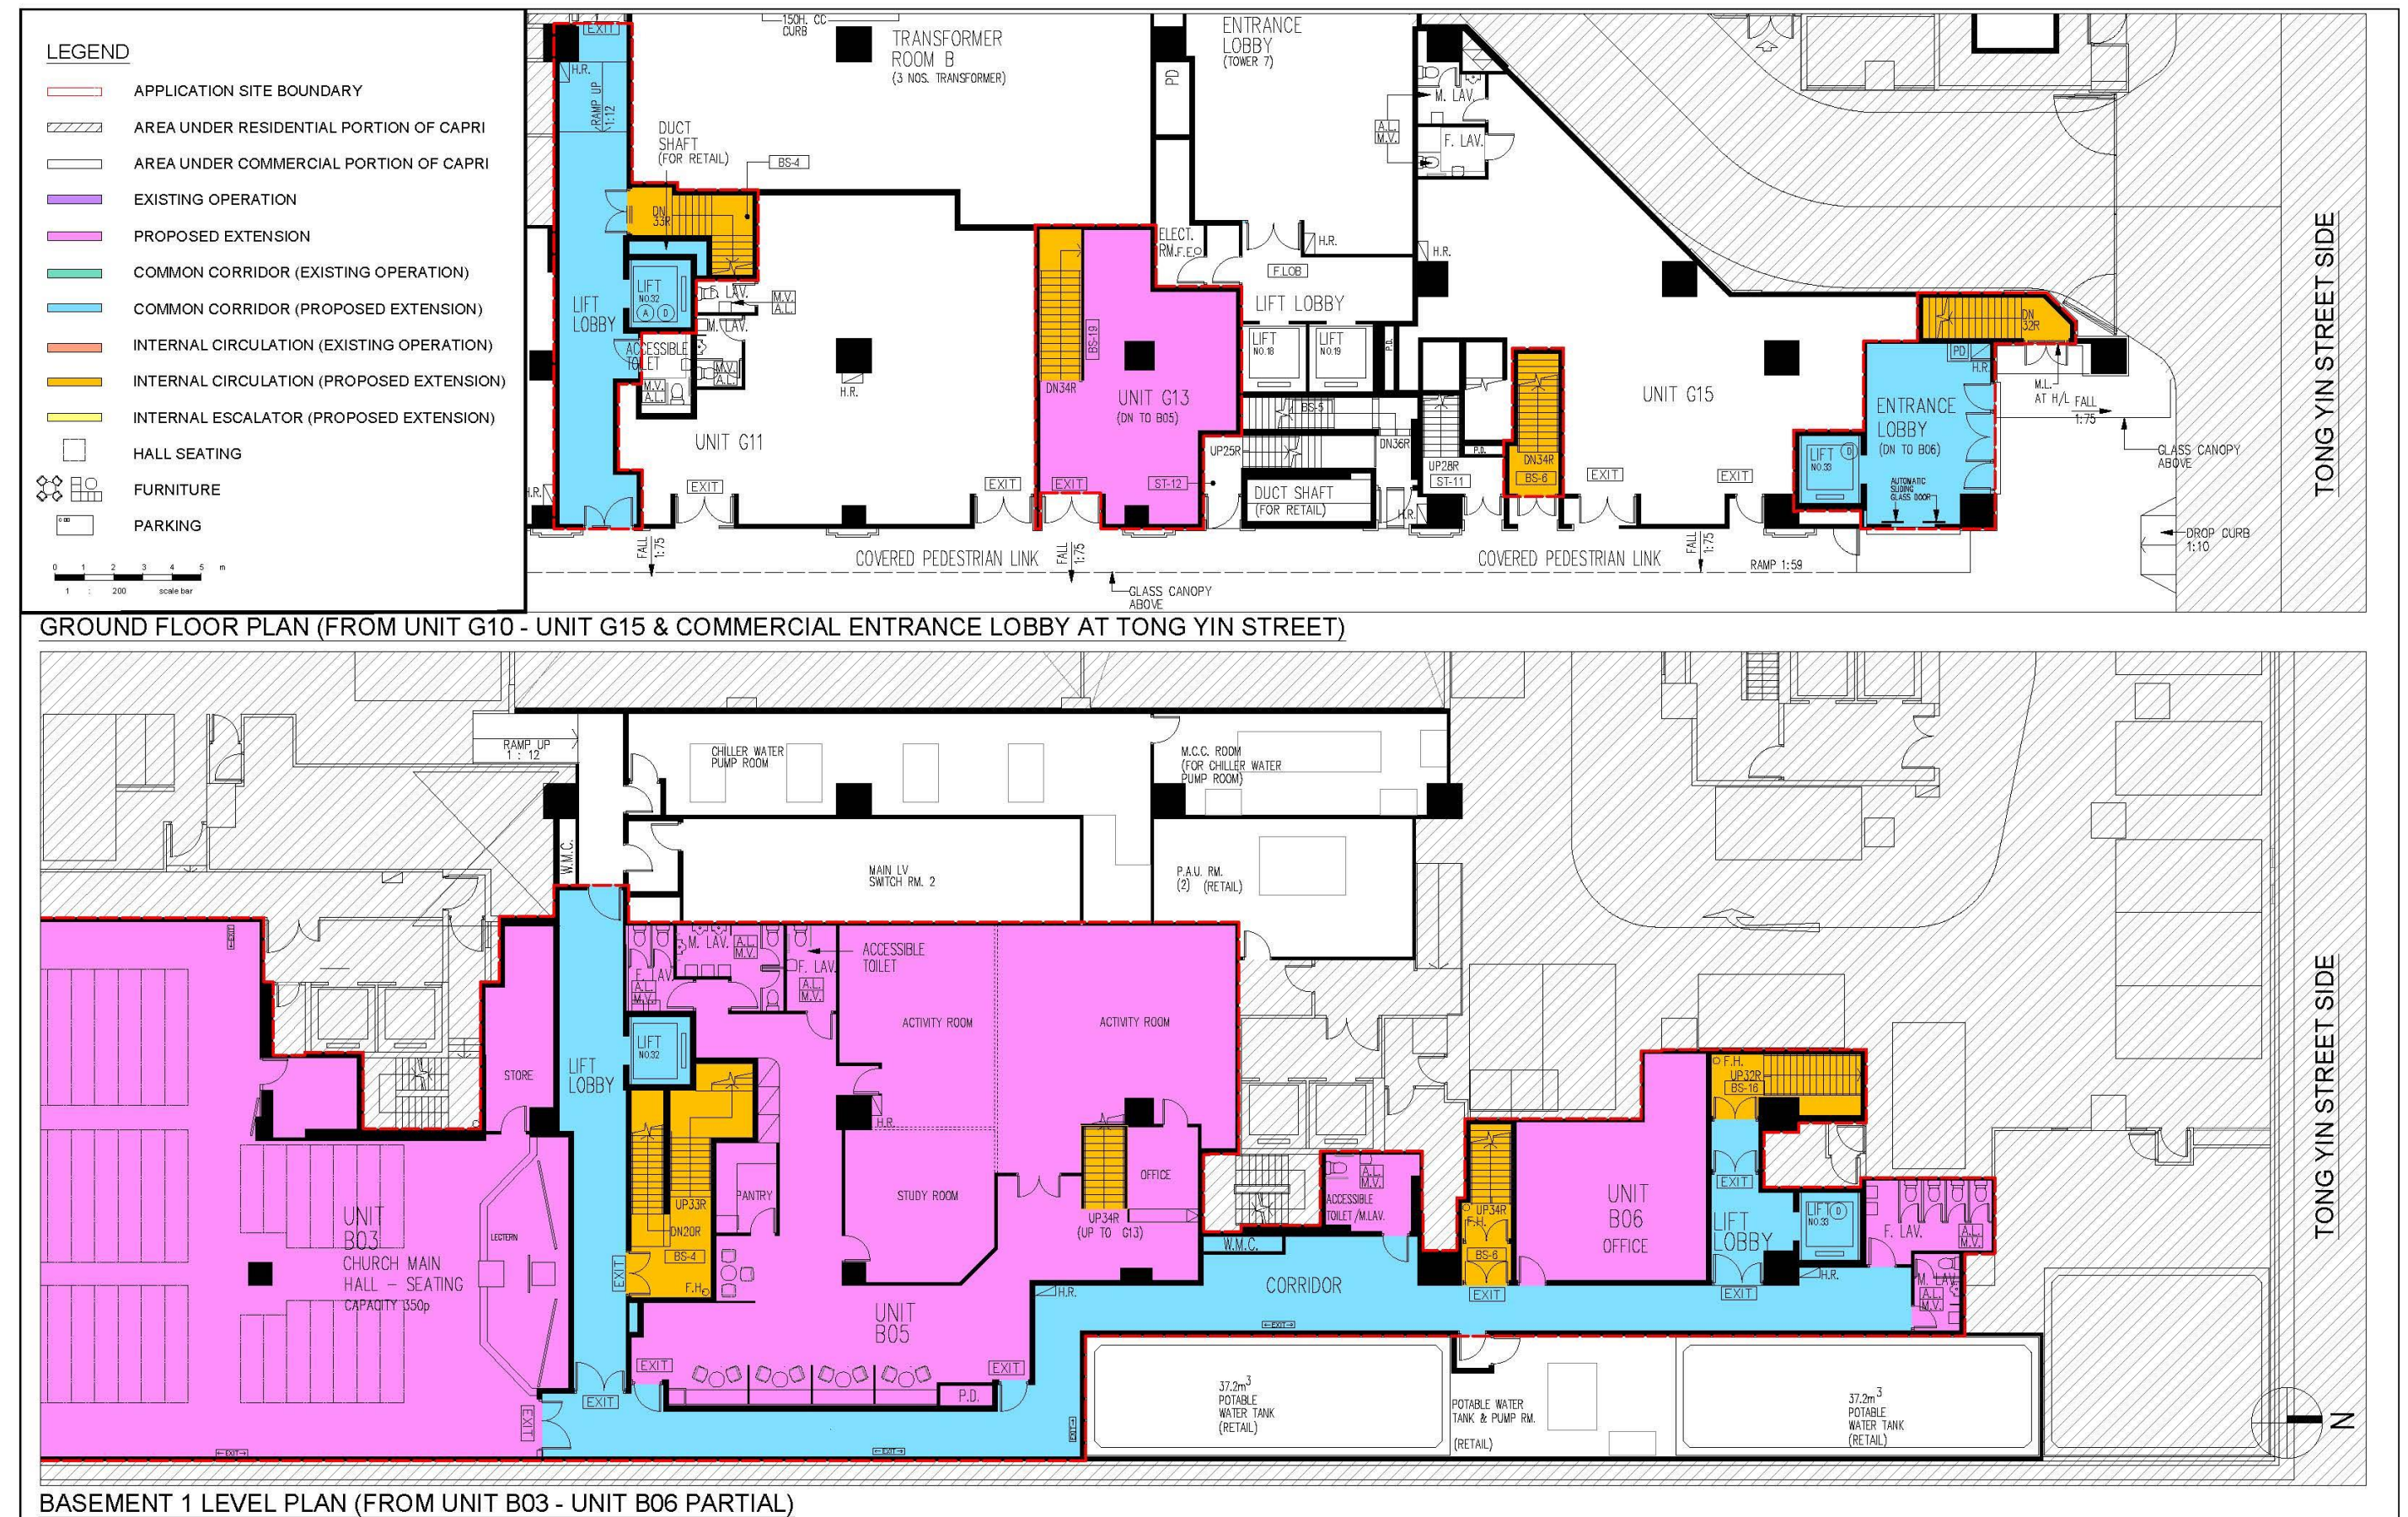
Proposed Uses at Northern Portion of Ground Floor and Basement Level 1
